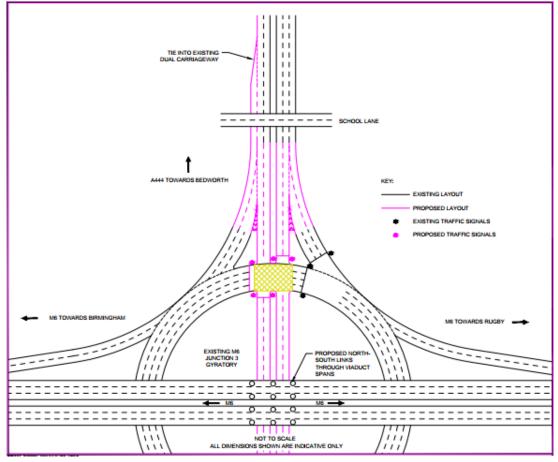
Option 1 (C-M6J3-3) Through Link Schematic (J3 north side)
